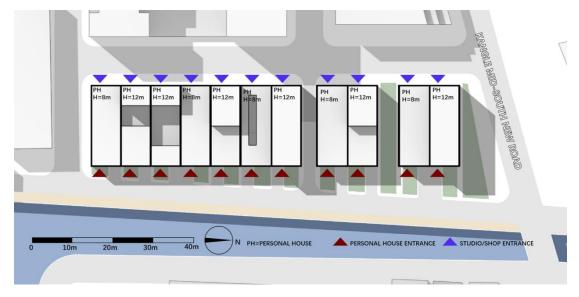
General plan of mixing at architecture scale (site 1) (source: the author)
